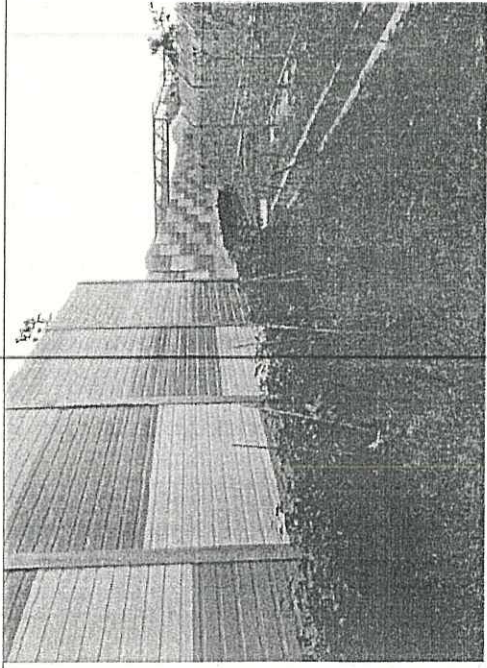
Noise barriers near the northern portal of Tai Lam Tunnel
